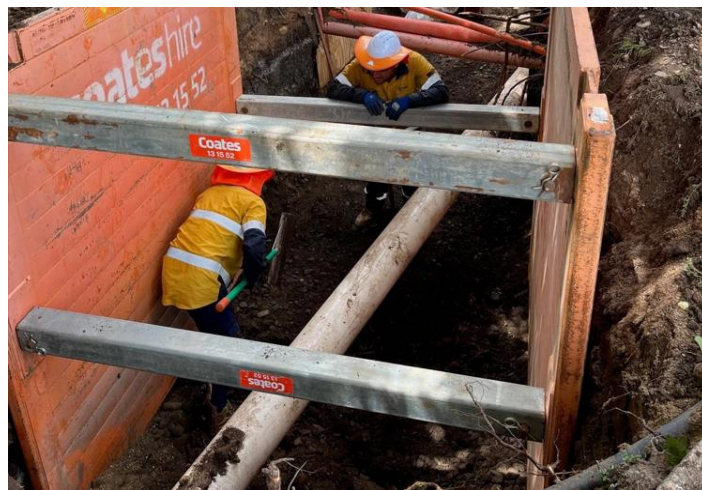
Trenches for new conduit being excavated, where they will join with conduit previously installed during foreshore development works.
